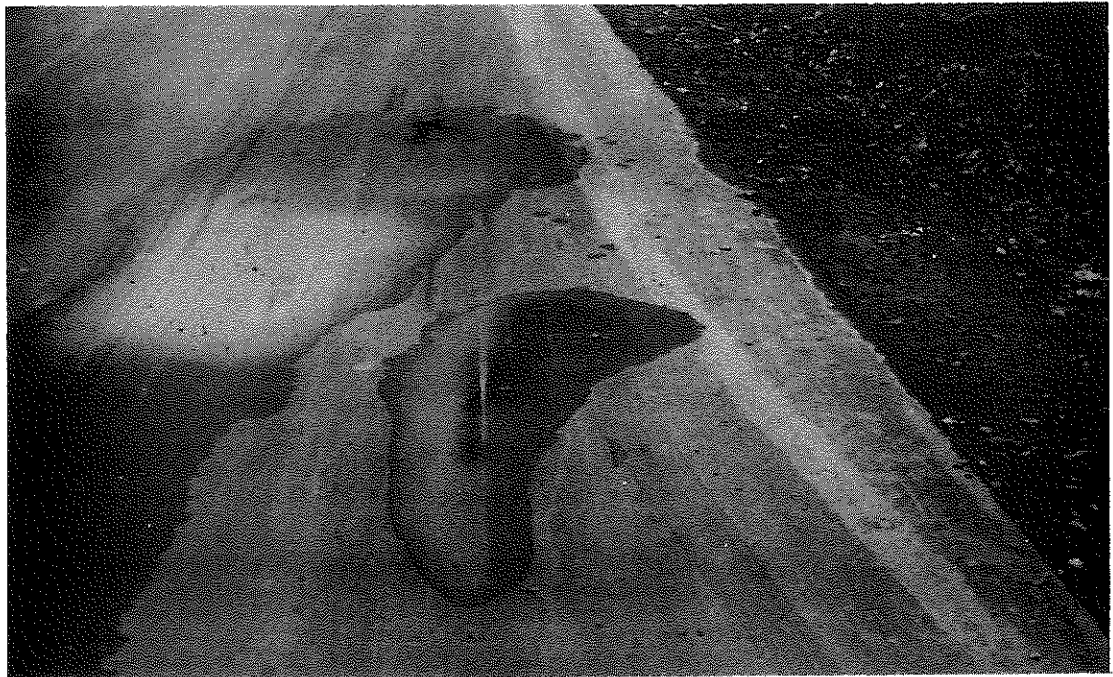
Pavement Failure, Church Street in Lewisburg; December 16, 1964. The failure was obviously caused by moisture in the subgrade.
